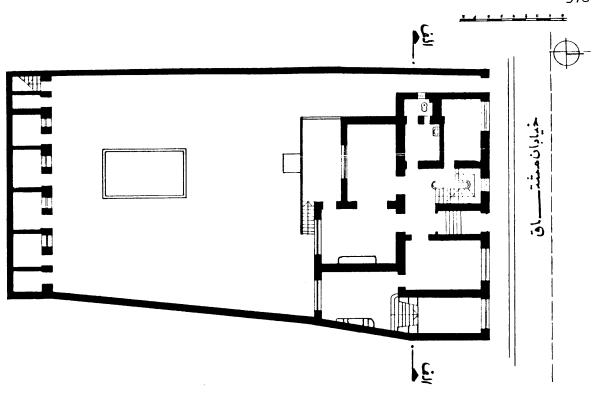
Site plan of rowhouse at 100 Moshtaq Street
